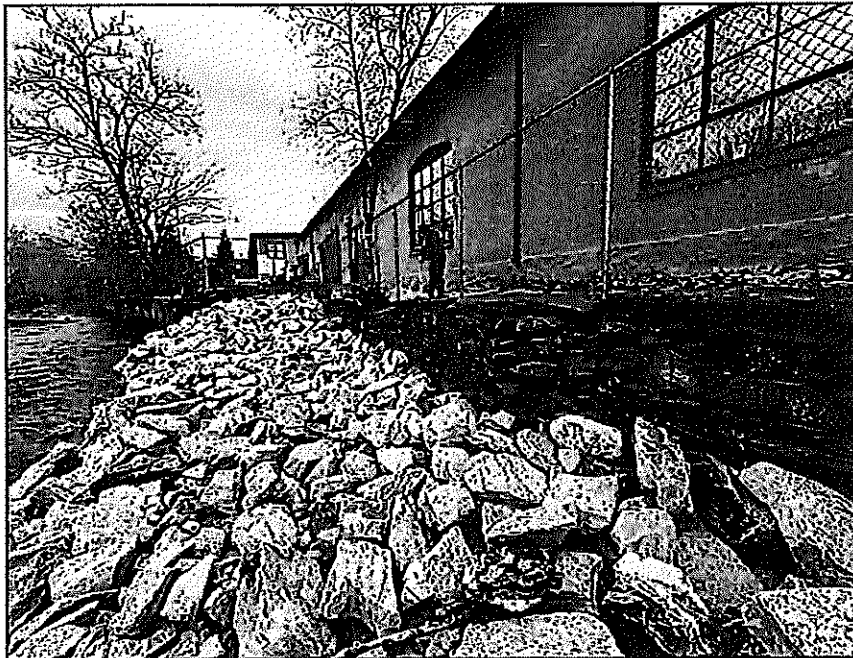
Masonry portion of channel wall near 0+25 looking downstream
